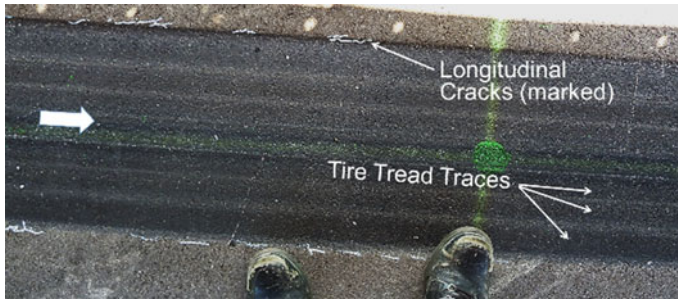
Surface view of the channelized pavement showing longitudinal cracks
